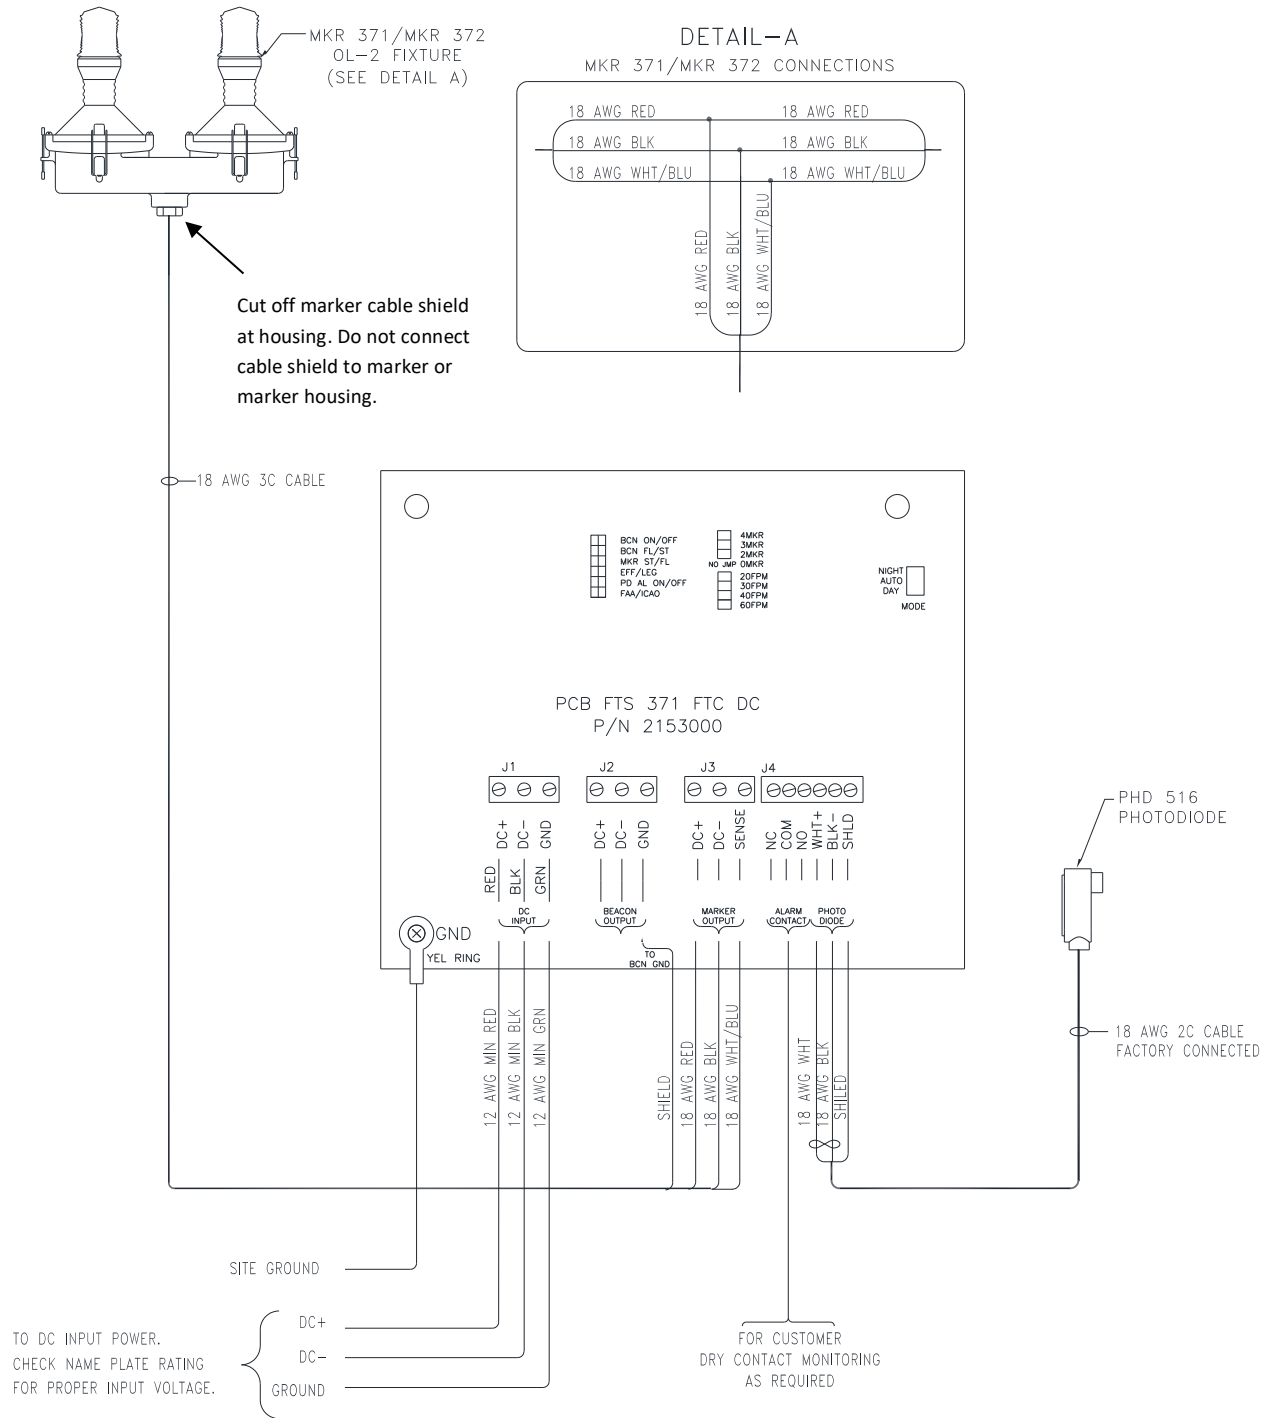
FTS 371 DC Typical FAA Type A0 Installation Wiring
